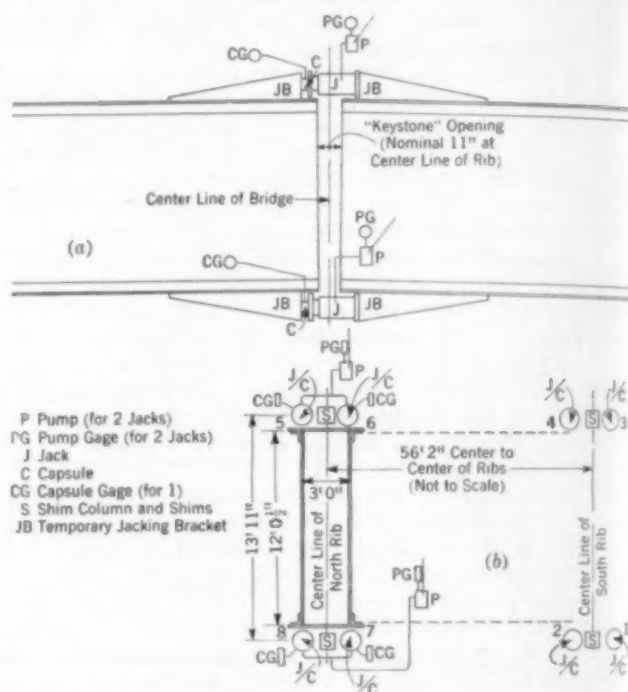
ARRANGEMENT OF JACKS AND CAPSULES AT CENTER OF RAINBOW BRIDGE
